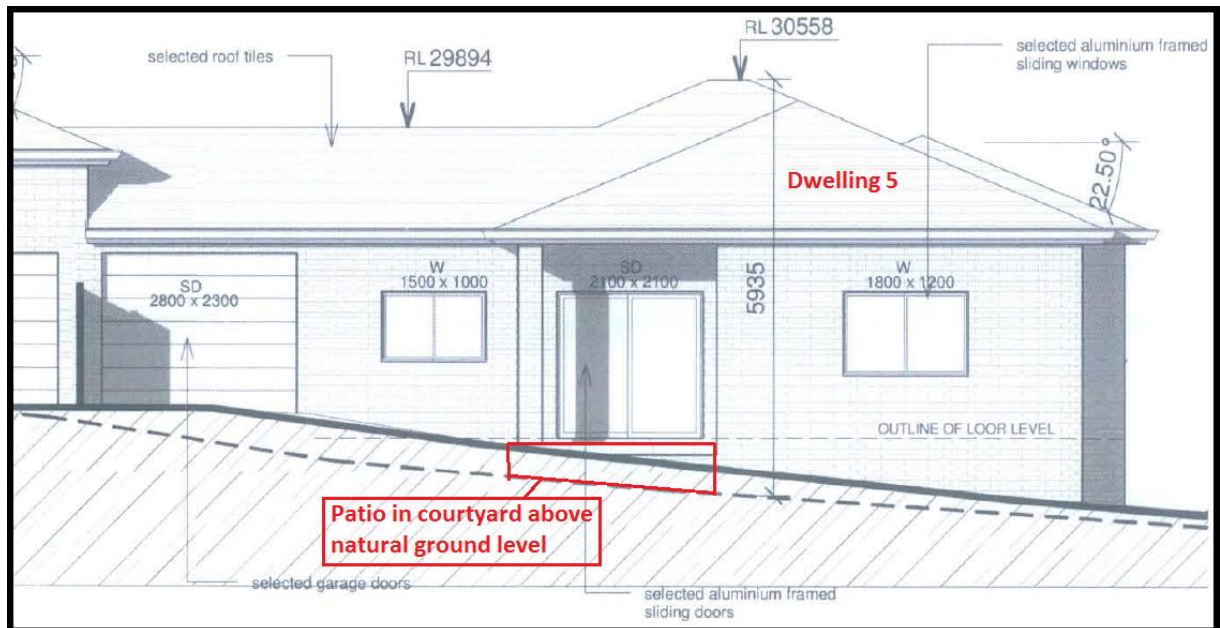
North elevation Dwelling 5. Due to the patio in the courtyard area of Dwelling 5 being slightly elevated above natural ground level, it is considered appropriate that a condition of consent be imposed to install 300mm lattice screening atop the fence to assist with the maintenance of privacy.
